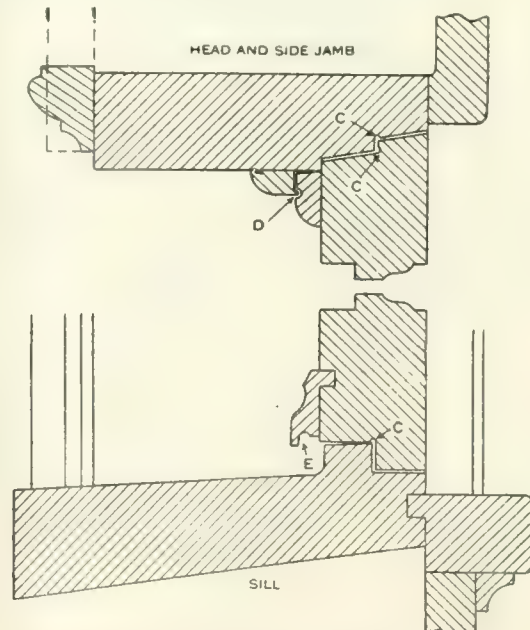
Vertical cross section of casement frame sash designed to swing in.
